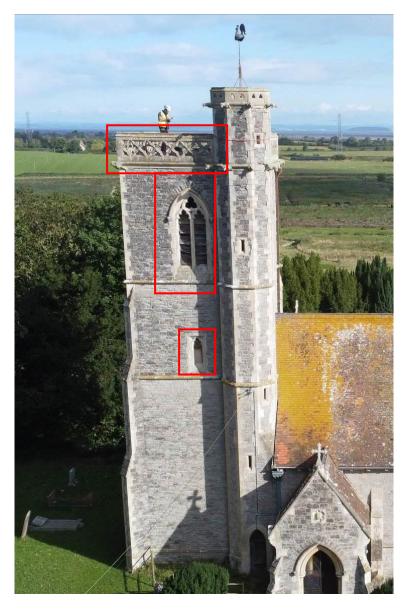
DJI_0196 Locations of Structural Issues in South Elevation
